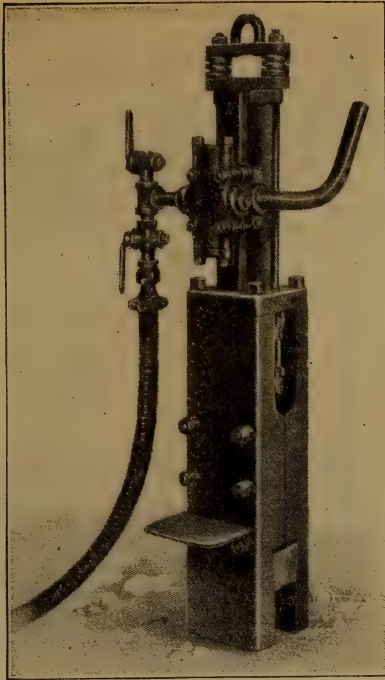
Steam or Air Pile Driver for 3-Inch Sheet Piling.
